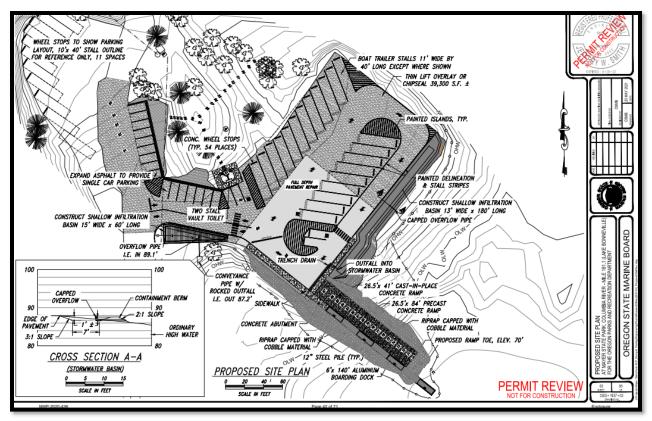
Proposed Mayer State Park Boat Ramp, Boarding Docking and Facilities Site Layout.
